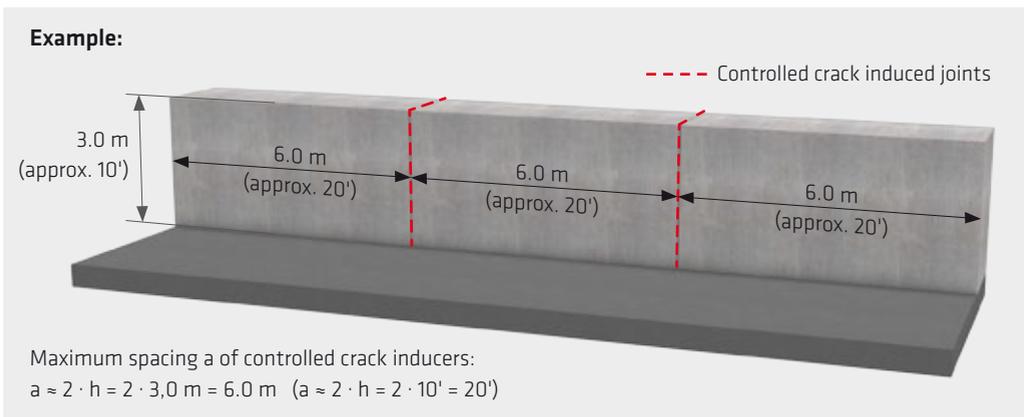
Sample calculation for the spacing of controlled crack induced joints in a wall
